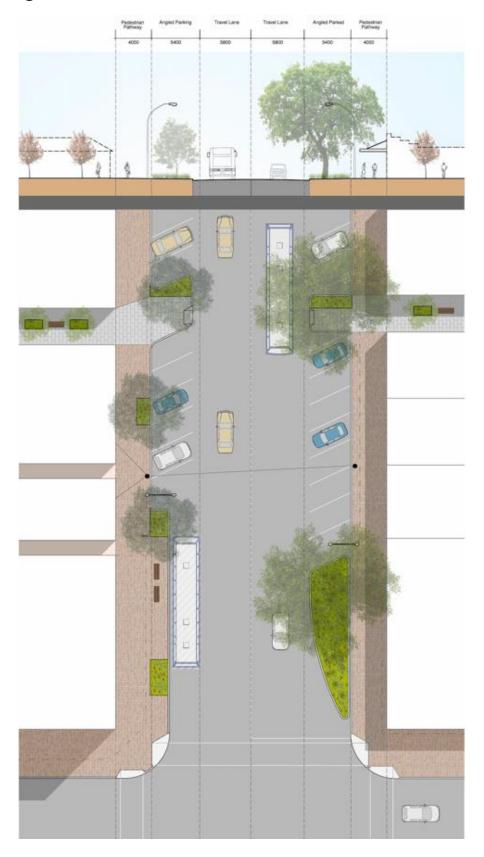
Typical treatment to Station Street between Cessnock Road & First Street
